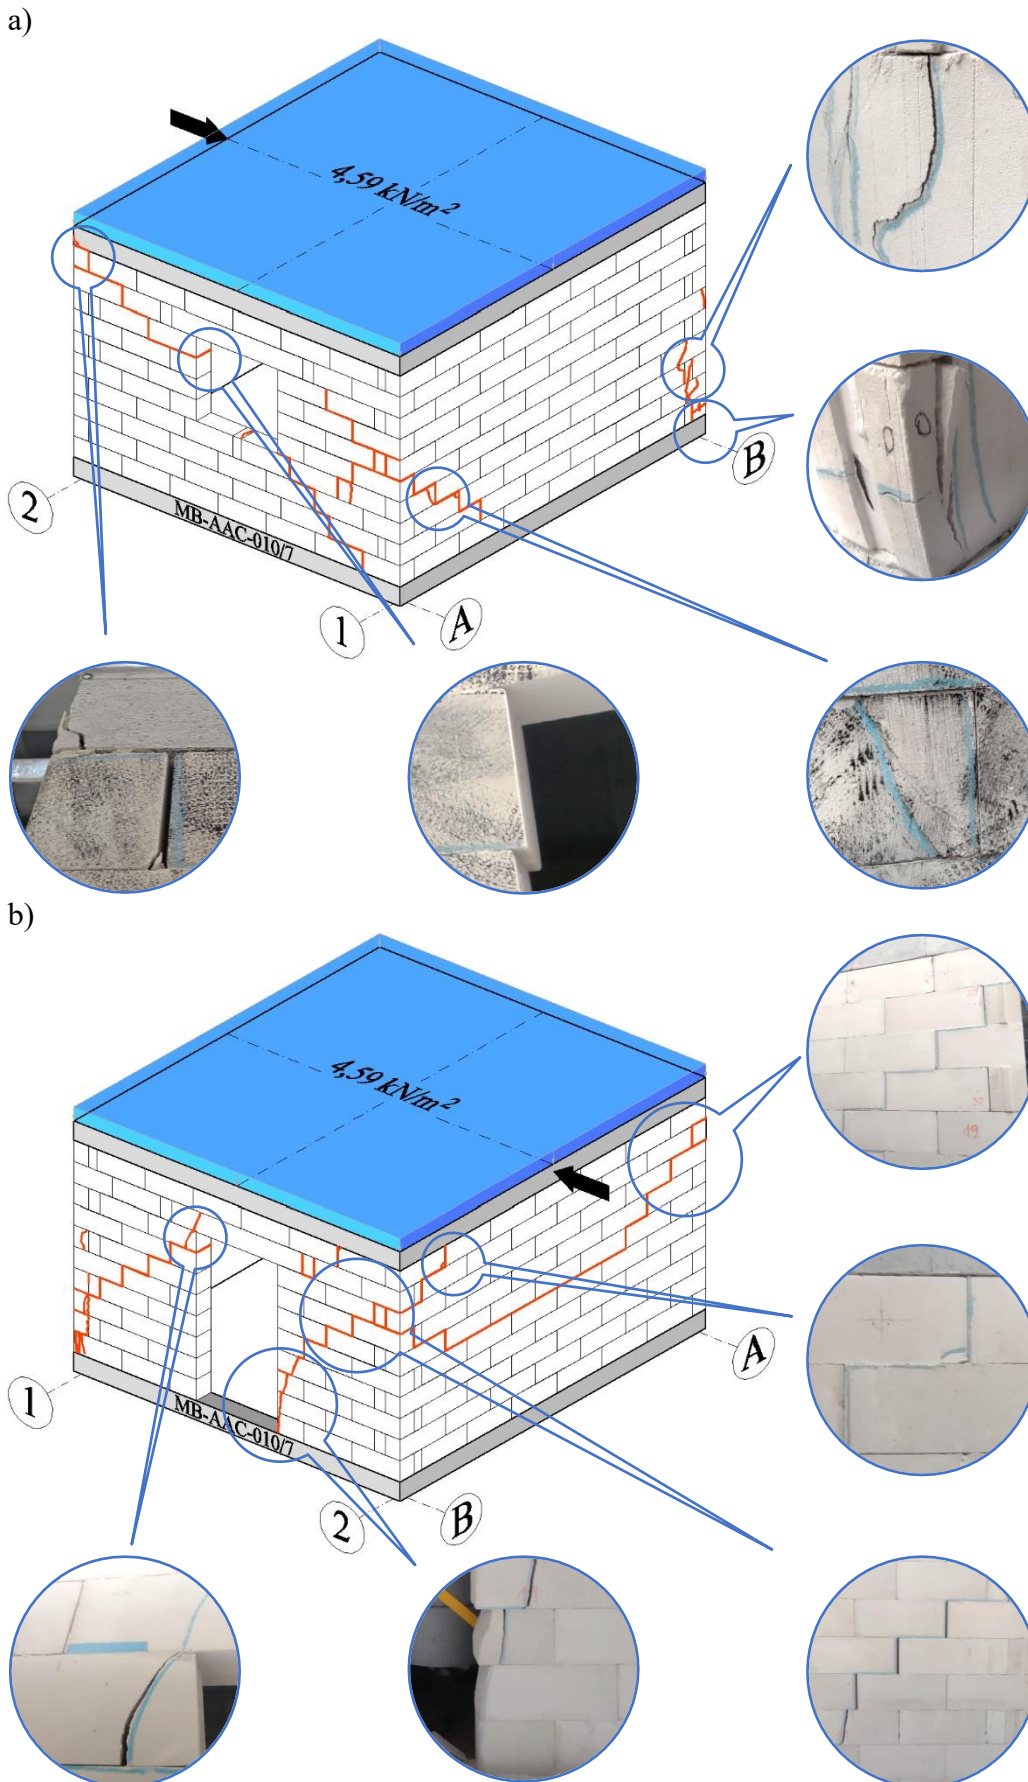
Crack pattern – model MB-AAC-010/7: a) view of the stiffening wall A with the window opening, b) view of the stiffening wall B with the door opening
